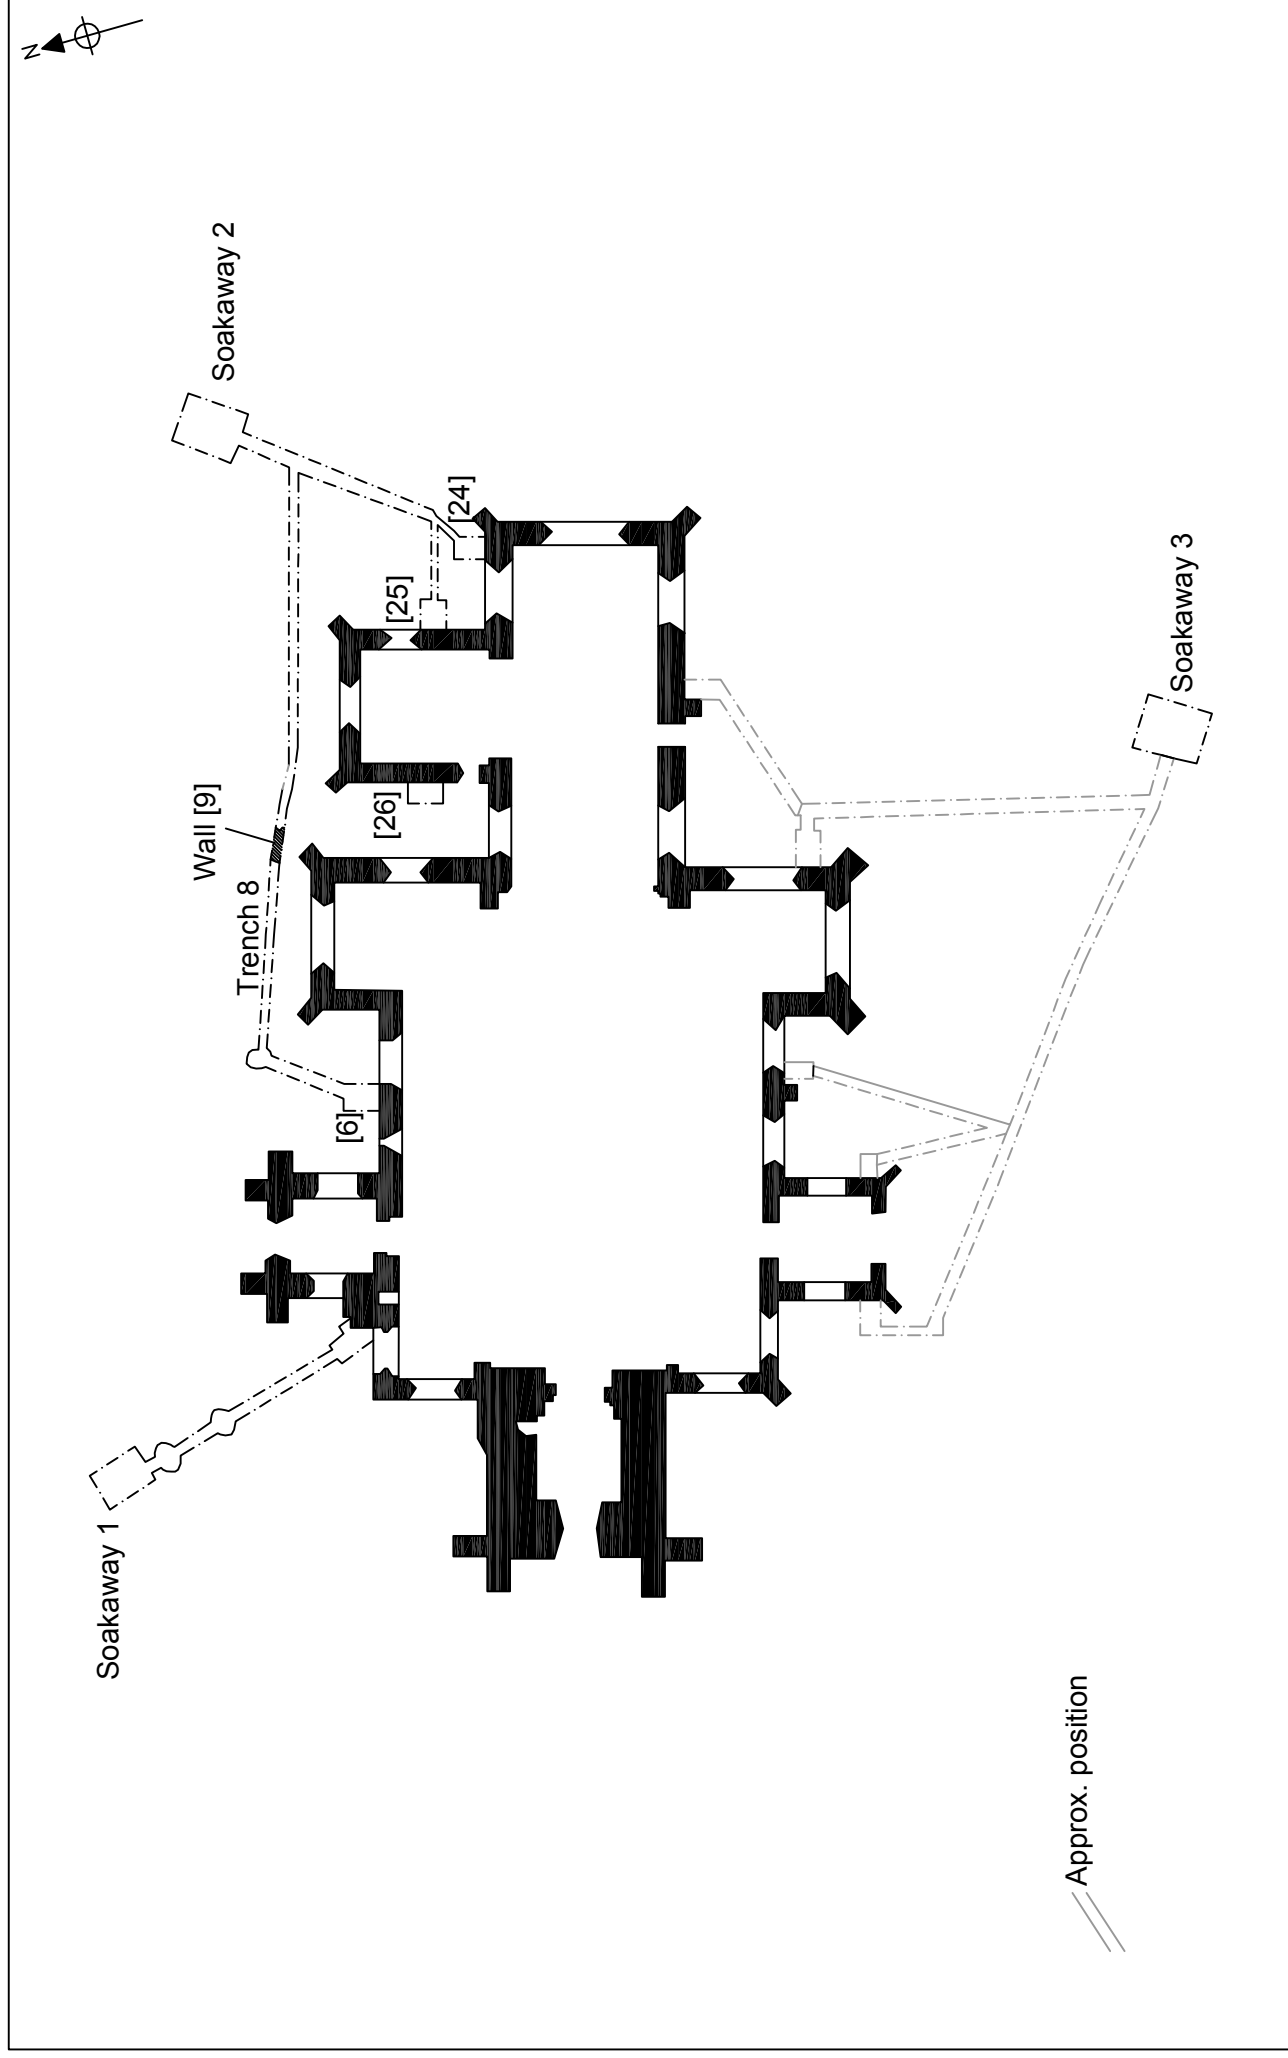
Plan showing gully and drain locations. Scale 1:300.
